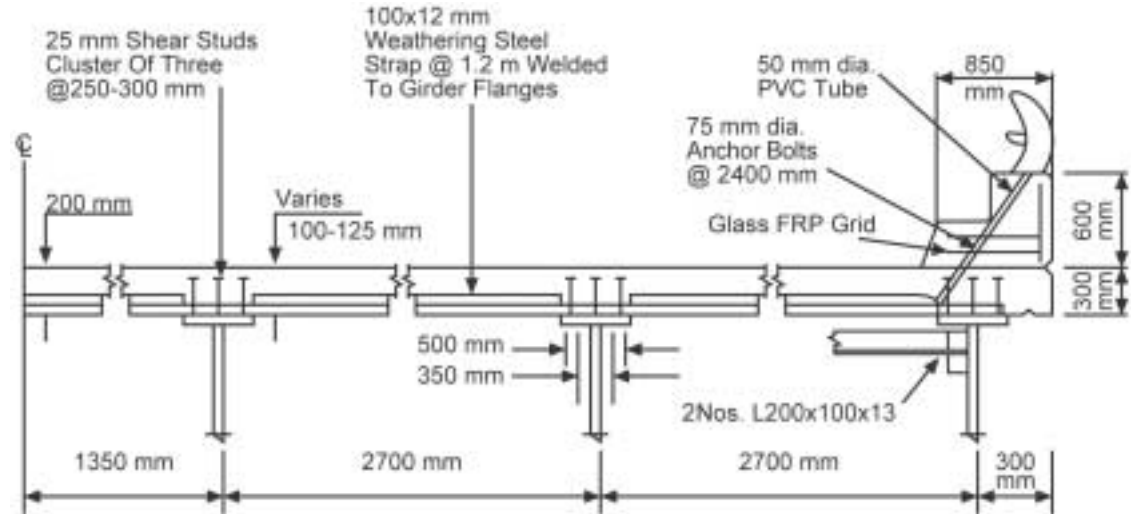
Cross-section of the Salmon River Bridge steel-free deck slab
